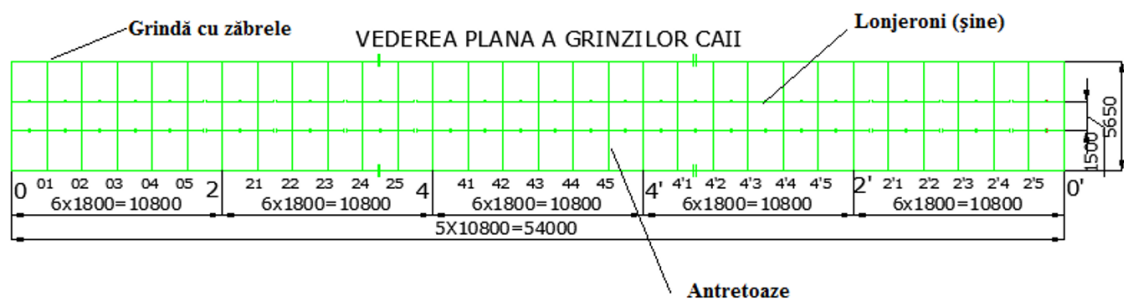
The bridge structure (plan view of the track beams) – Case Study
